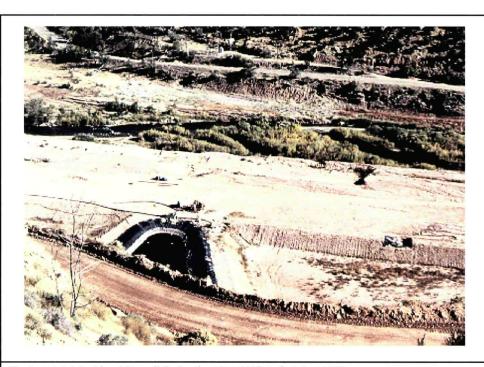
Lined Runoff Collection Pond RC-4, October 1999
